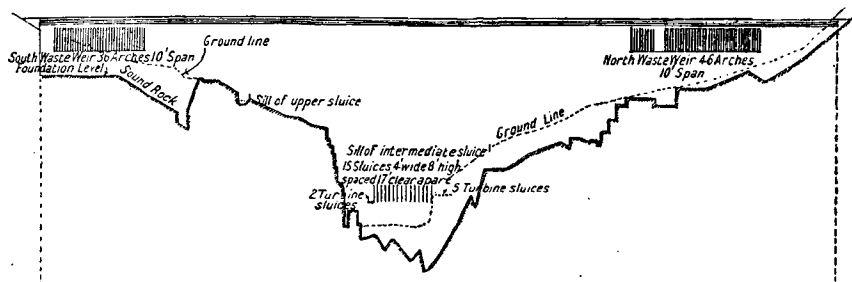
Longitudinal Section, Bhatgarh Dam.
